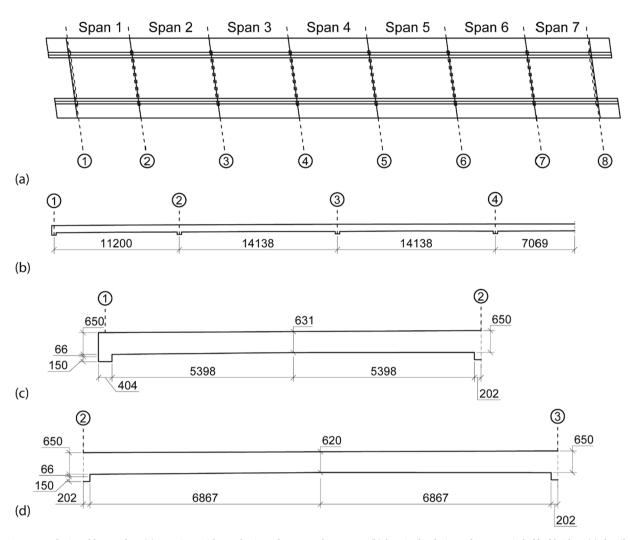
Geometry of Nieuwklap Bridge: (a) top view with numbering of spans and supports, (b) longitudinal view of symmetric half of bridge, (c) detail of longitudinal view for span 1, (d) detail of longitudinal view of span 2. Units: mm.
